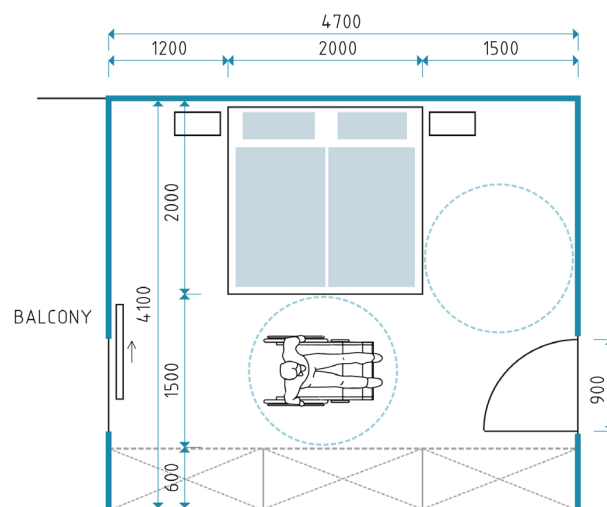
Illustrative floor plan of an accessible bedroom with a double bed (Lacho, Suláková)
